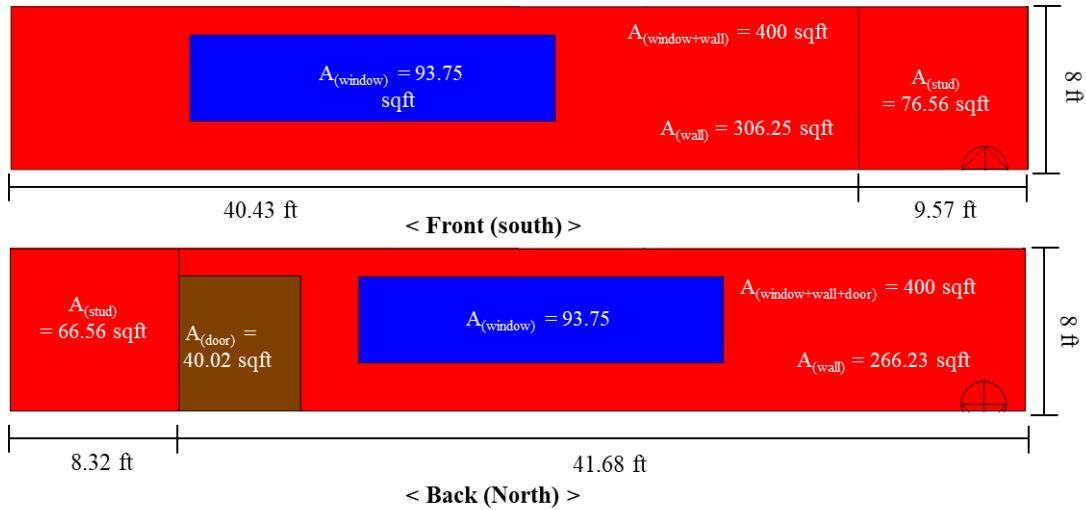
Calculation example for stud and non-stud portions of the exterior wall
